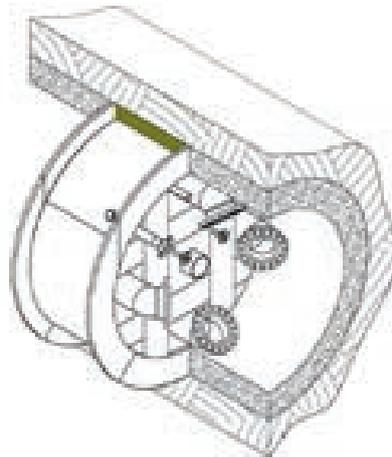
First design of the hydraulic seal: bentonite (shown in green) is placed against the Boom Clay, after which the components making up the steel structure are assembled by welding.
